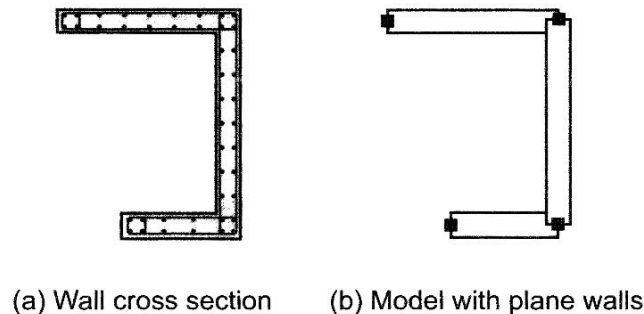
Wall section modeled as several plane walls [Taken from Powell (2010)]
